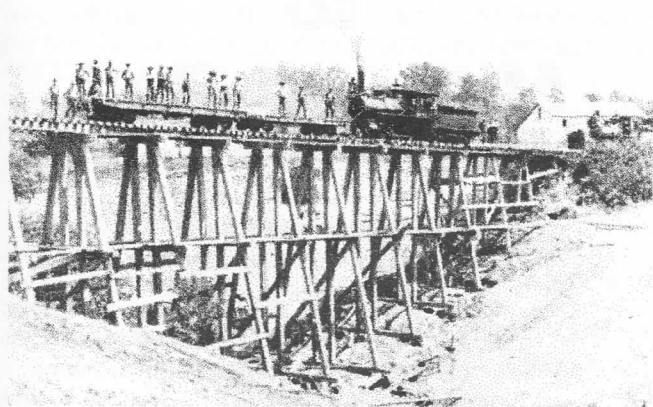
One week after the wreck in photo #1, this photo was taken of the bridge gang and work train on the rebuilt trestle. Note the bottom of the bents on the left side of the trestle. Pickenpaugh Photo Collection.
